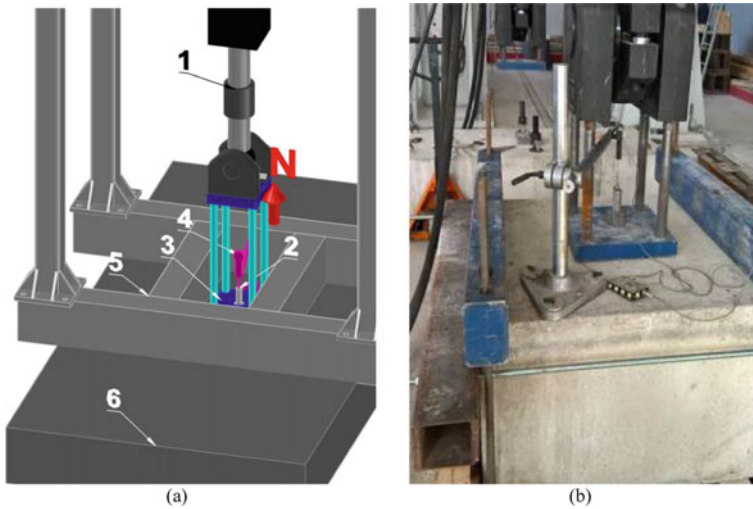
Test setup: a 1—hydraulic cylinder, 2—anchor, 3—fastened element, 4—displacement gauge, 5—loading frame, 6—concrete base; b anchor specimen during tests
